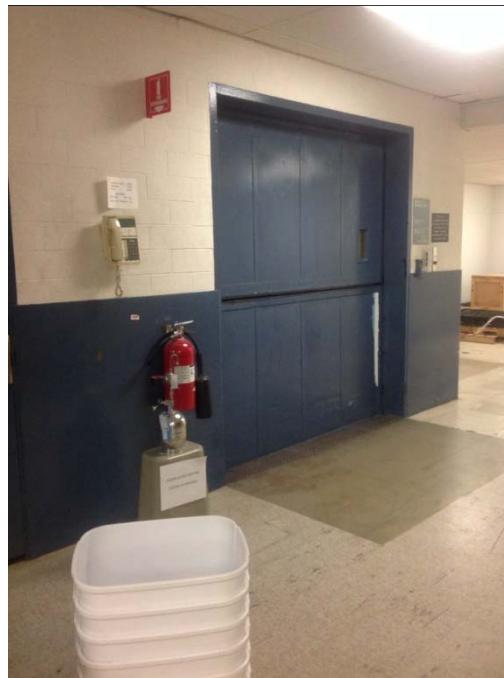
Sample IA1065, located in walkway/elevator entrance.
